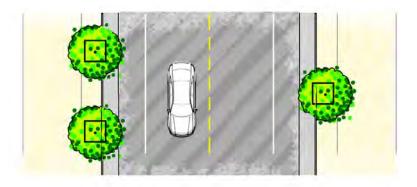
Urban Street-Parallel Parking (Collector-Street Section S)
